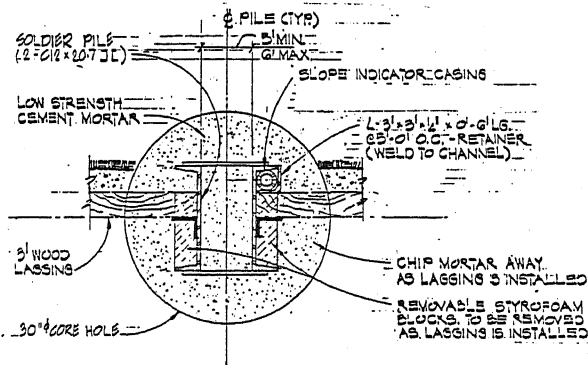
(a) Detail - Soldier Pile and Wood Lagging
